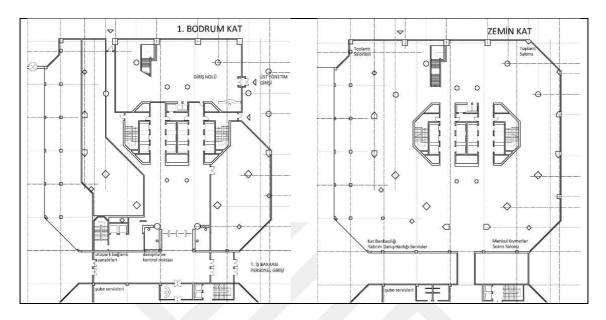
First basement (entrance floor) and ground floor plans of İş Tower
